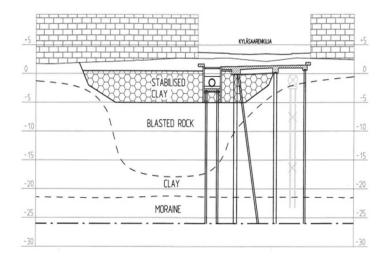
Arcada II cross sectional cut of the site with stabilised clay and steel-pipe columns. Houses are built later on both sides of the road.
